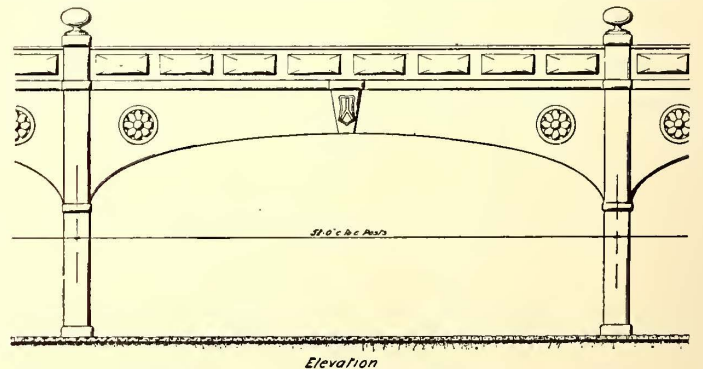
ELEVATION OF SUGGESTED CONCRETE STRUCTURE
